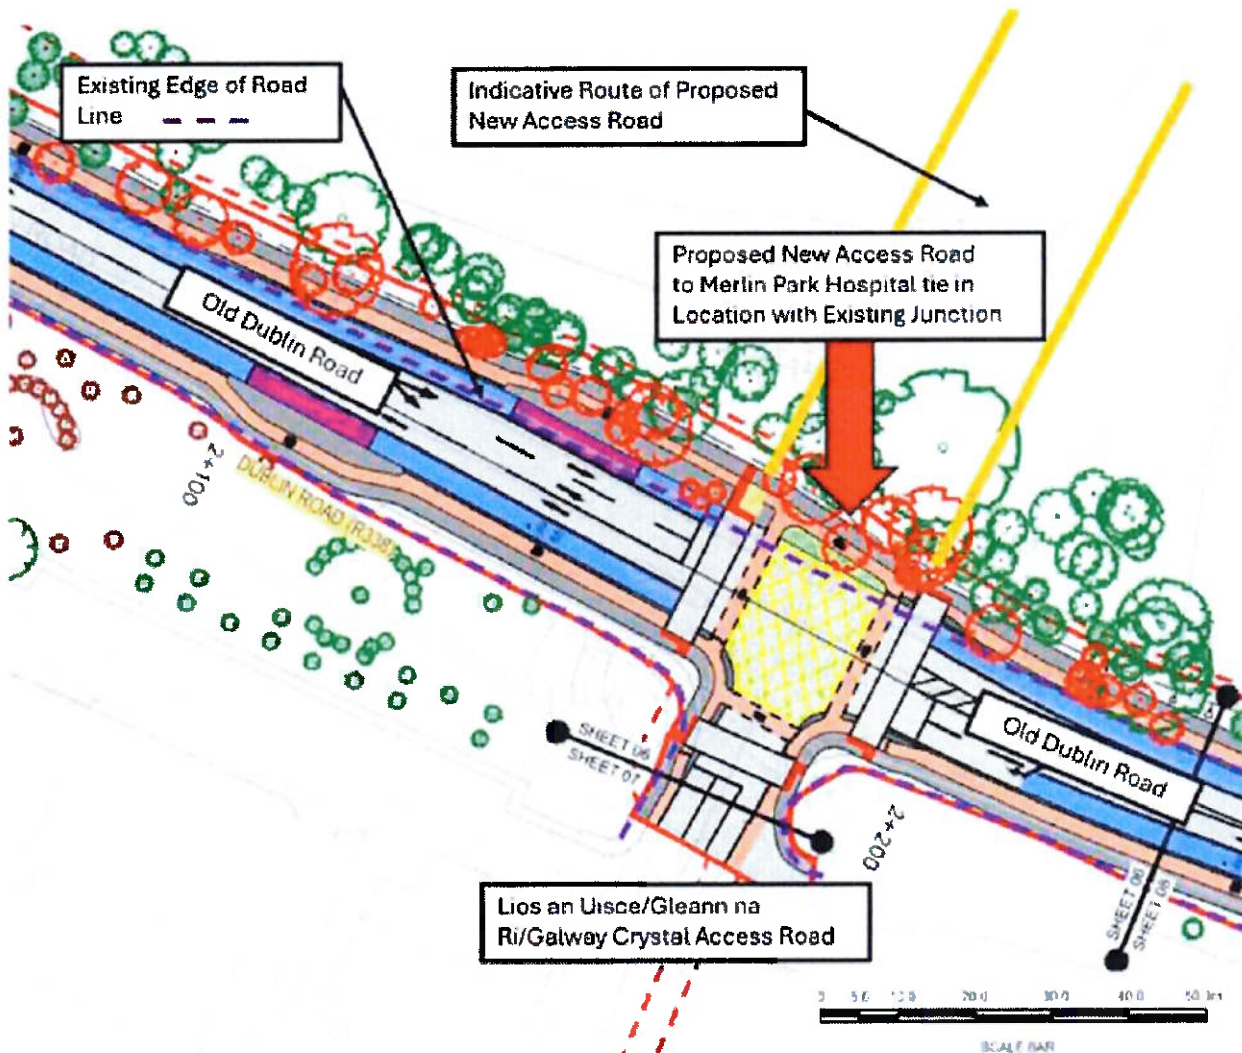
Location of New Access Road Relative to Existing Road Network
